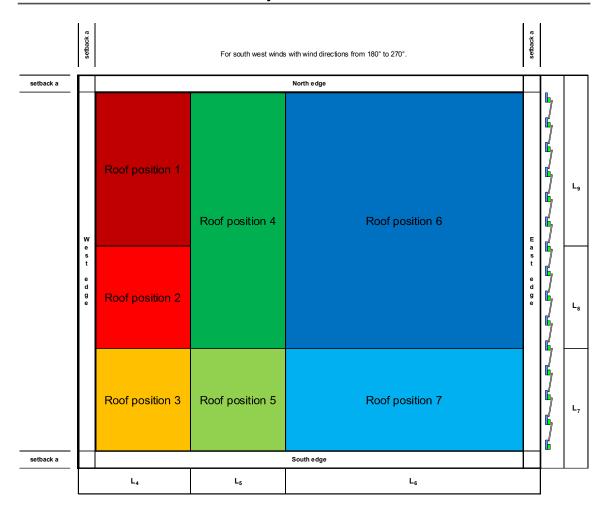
Definition of roof zones for the solar ballasted roof mount system "FastRack 510" with a minimum offset "*a*" from the roof edges equal to or greater than 1.0 m and for south west winds from 180° to 270°; valid for flat-roofed buildings with a maximum roof angle of 7°
